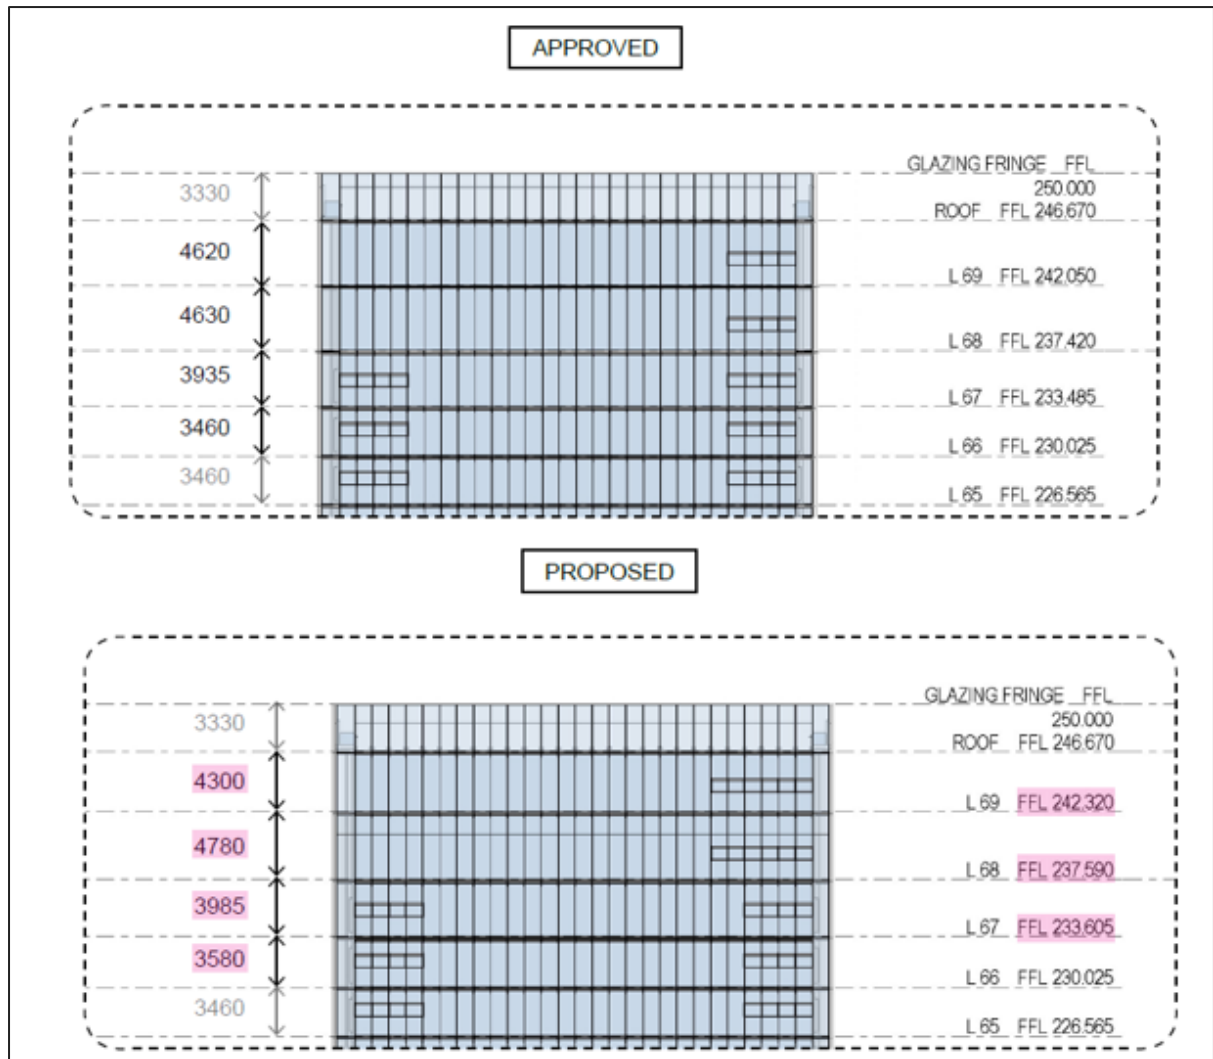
| Location of proposed external amendments to the building (Base source: Applicant's Design Report)
